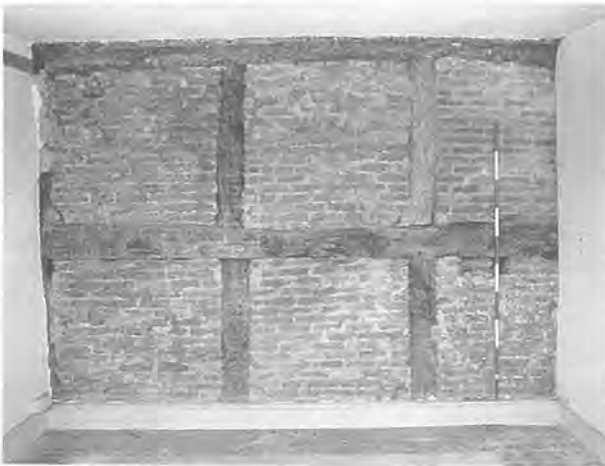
29 High Street: Elevation of East Bay: First Floor.
